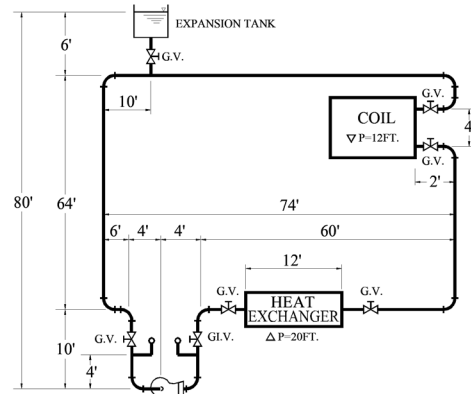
PUMP SYSTEM TOTAL HEAD AND PUMP CASING WORKING PRESSURE
